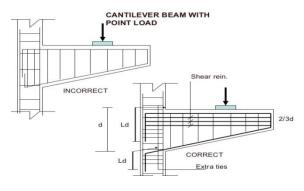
Reinforcement Details of cantilever beam for Earthquake Resistant structure
